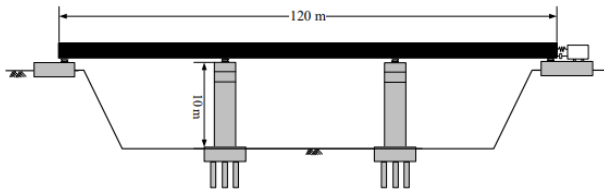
Schematic diagram of three-span continuous girder bridge and TMD
